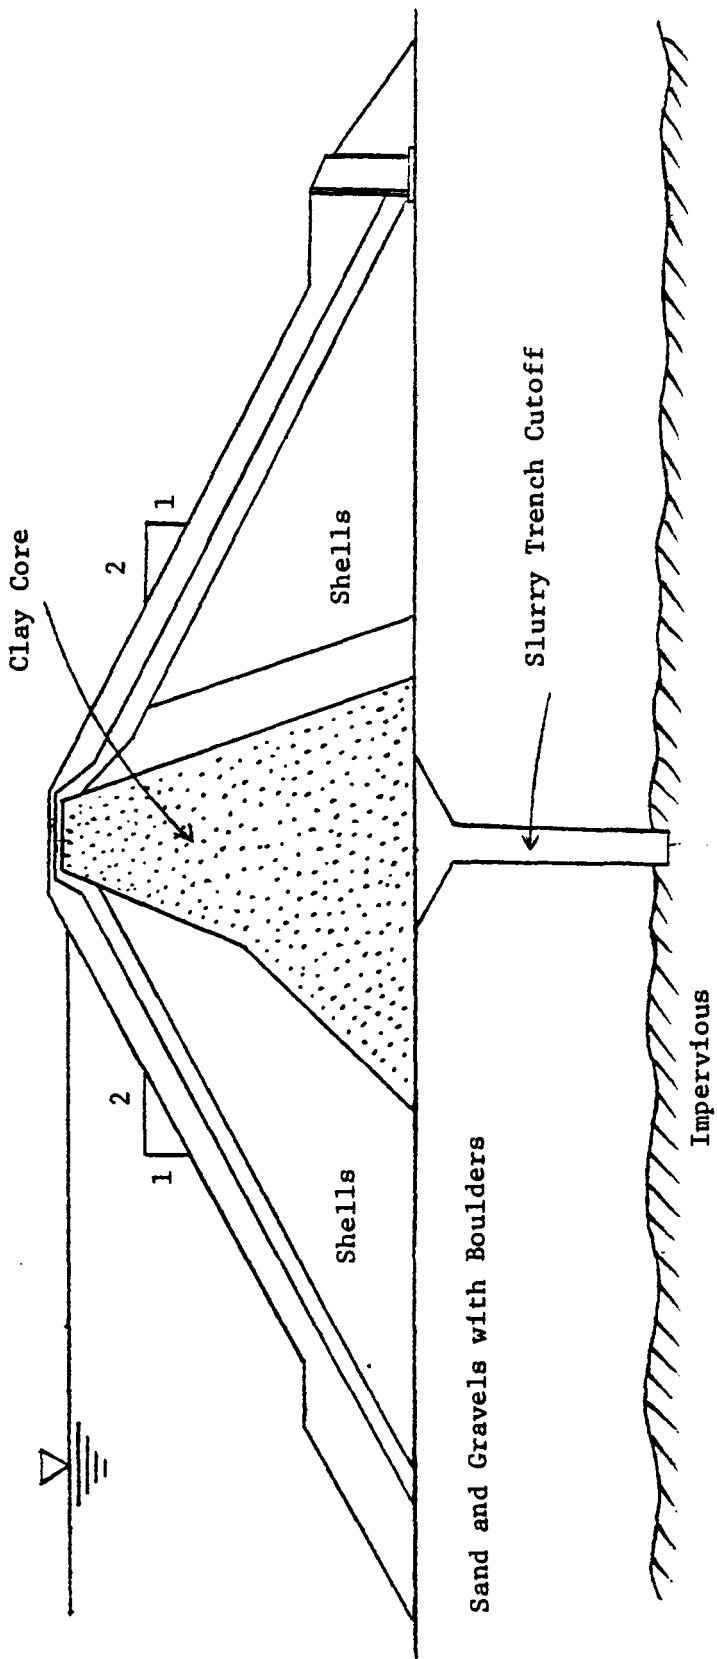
Cross section of Tortoles Dam, Mexico [Ref. 8].
